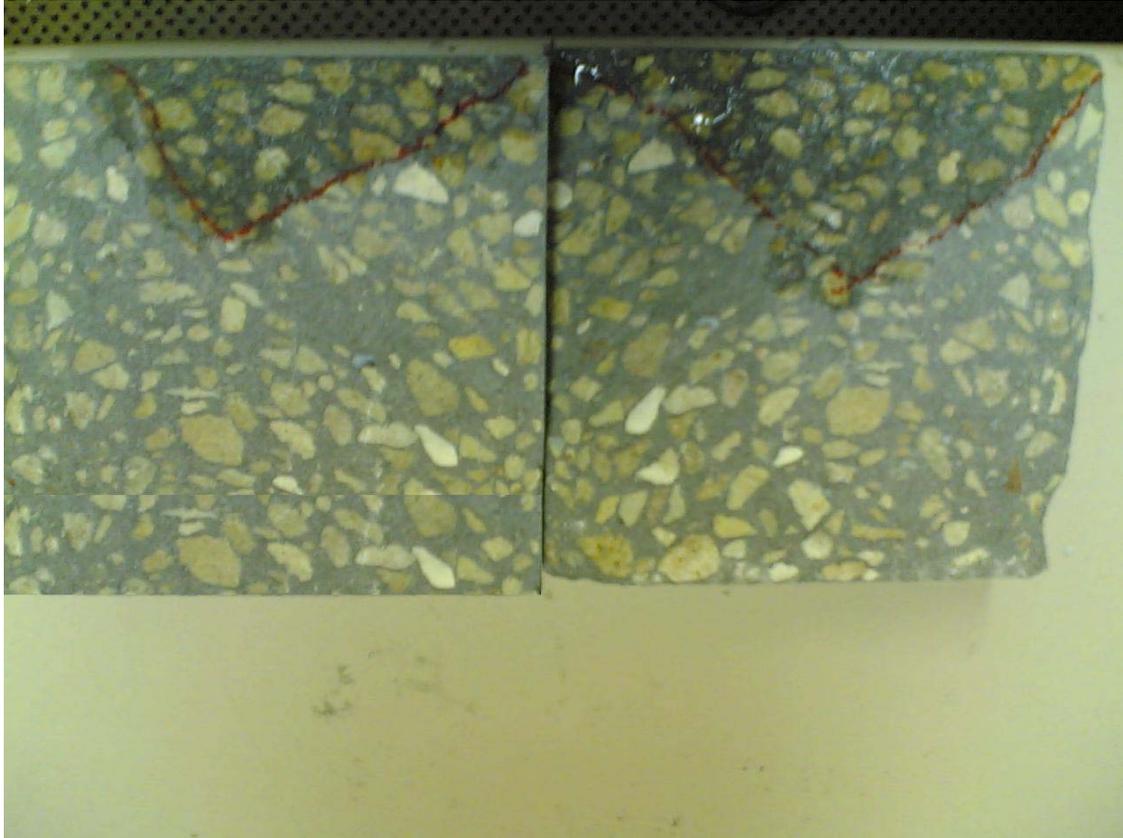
Concrete specimen showing Depth of Water Penetration.
